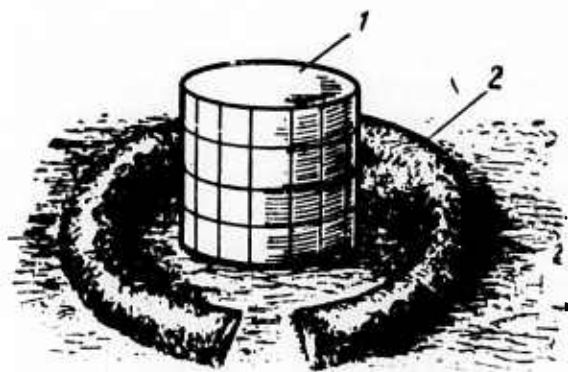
Structure with earth embankment around liquid fuel tank: (1) liquid fuel tank; (2) earth embankment.
